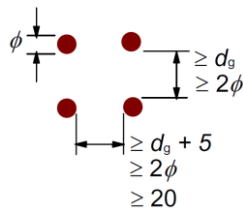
Minimum spacing between prestressing elements - Eurocode 2-1-1, p.156
